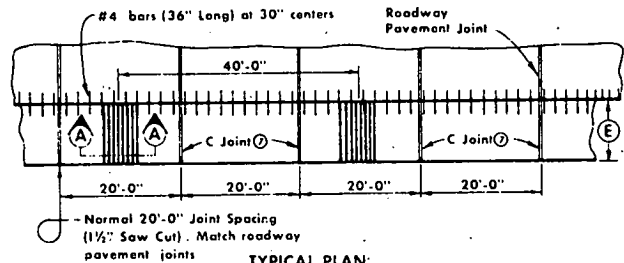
Typical concrete shoulders adjacent to rigid pavements.
